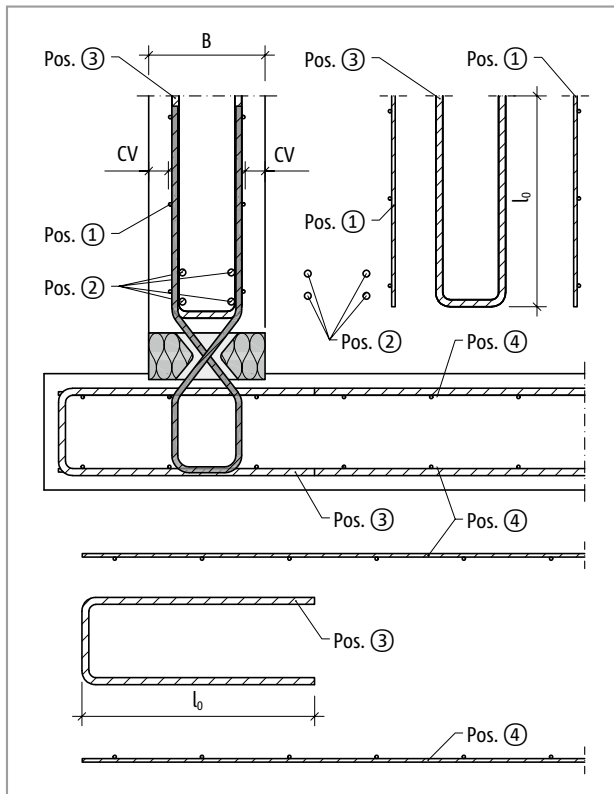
Schöck Sconnex® type W-N-VH: Variant B – on-site reinforcement for connection to the foot of wall
